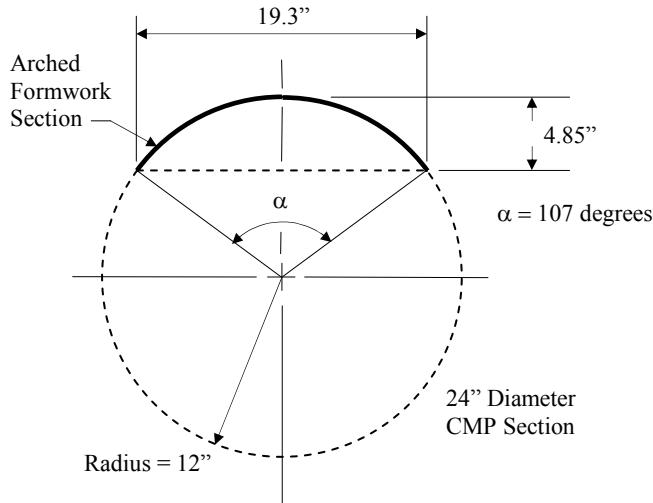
Stay-in-place formwork section cut from the 24 in. diameter CMP used in MBISB 1.
